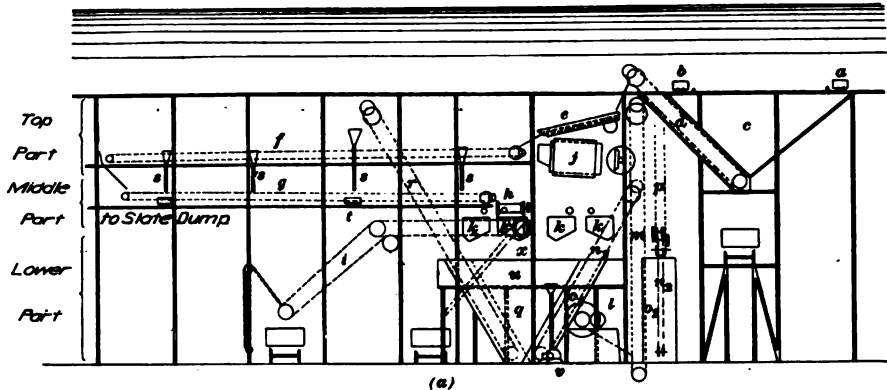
GENERAL PLAN OF COAL-WASHING PLANT OF THE STANDARD COAL CO., BROOKWOOD, ALABAMA
